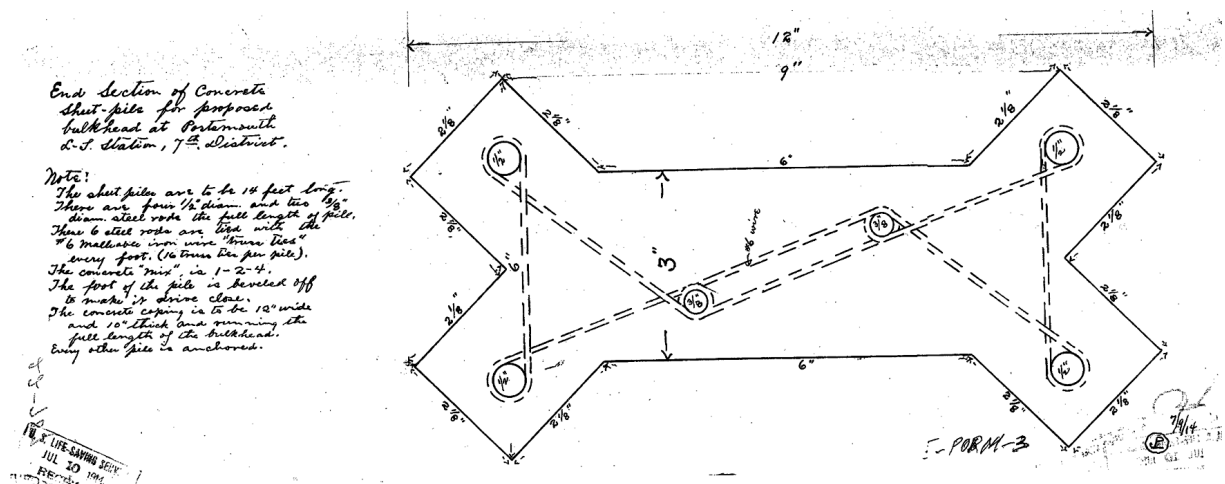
“End Section of Concrete Sheet-pile for Proposed Bulkhead,” July 9, 1914; used to construct seawall in 1915. (National Archives and Records Administration, Philadelphia, PA, Record Group 26)
